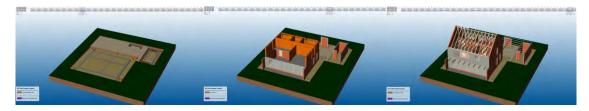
Sections of 4D simulation: construction of sewer shaft (left), construction of the wall on the first floor (middle), making of the roof structure (left)
